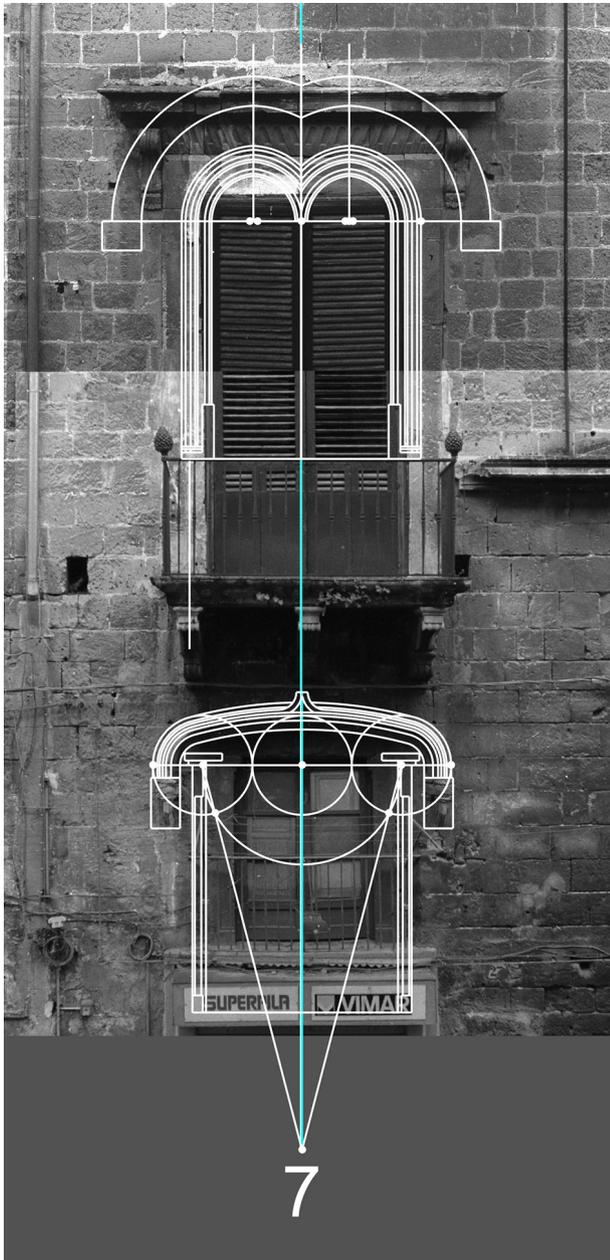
Drawing of window 7 at the mezzanine and at the piano nobile.
